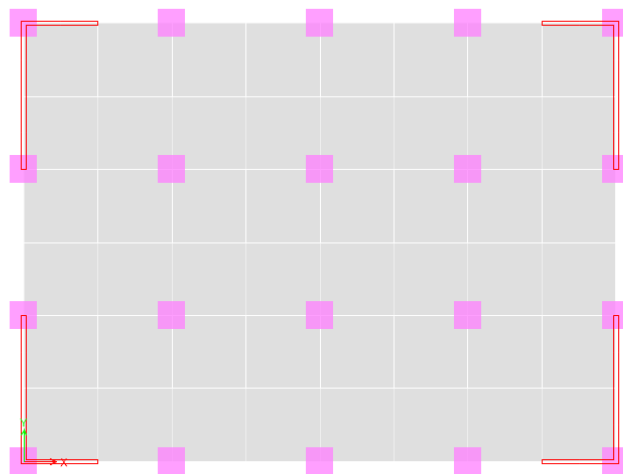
2D plan of 8th story rectangular shape building case SW2
